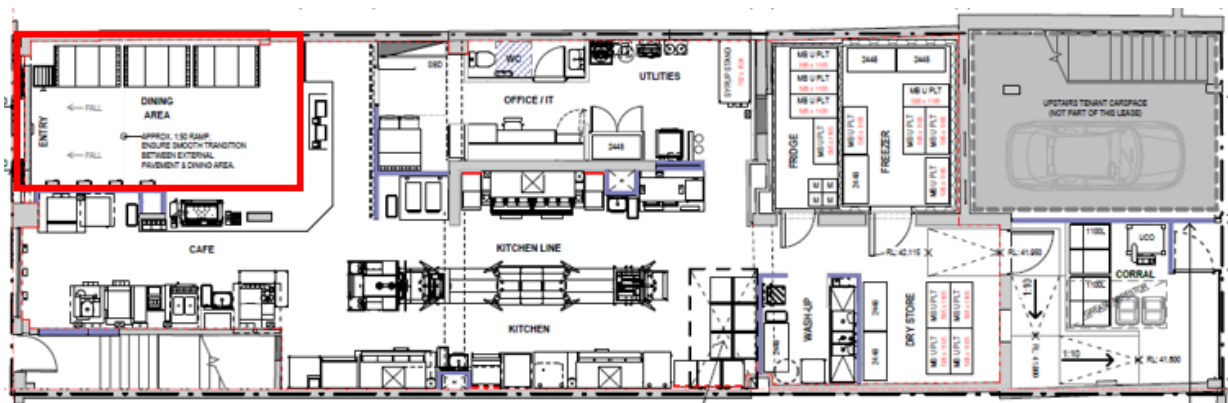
Proposed floor plan (indoor dining seating area outlined in red)
